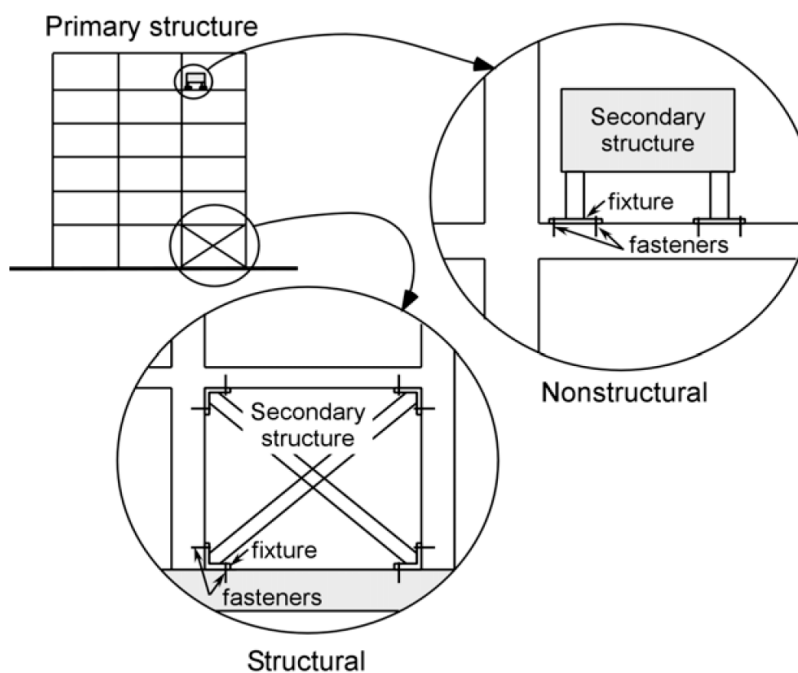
Structural and nonstructural applications for fastenings, [15]
